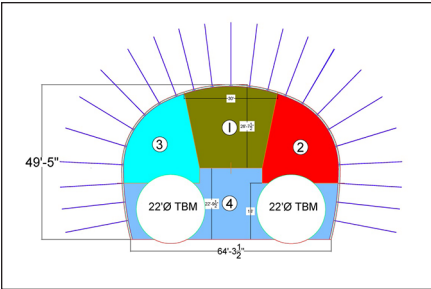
Station cavern excavation sectional plan showing the top heading and bench excavations
